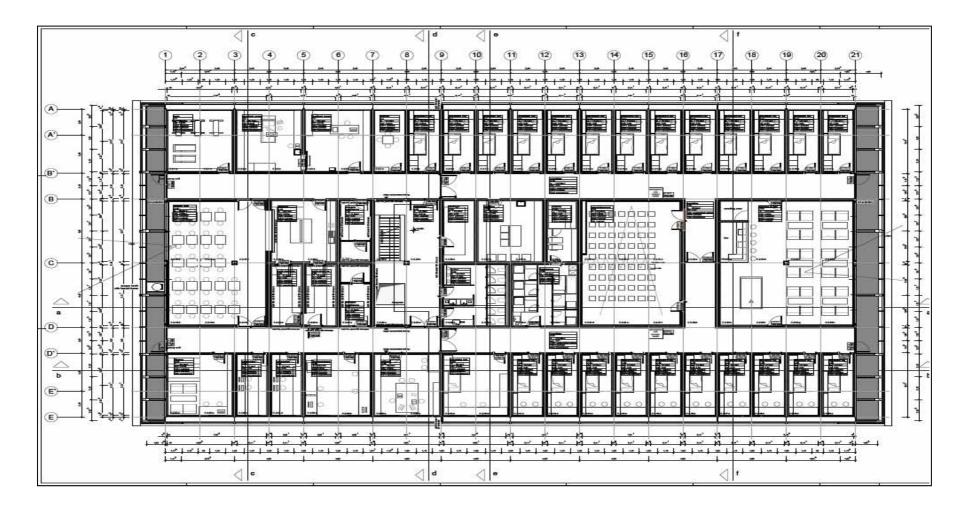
FACILITY DISTRIBUTION IN THE SECOND FLOOR
